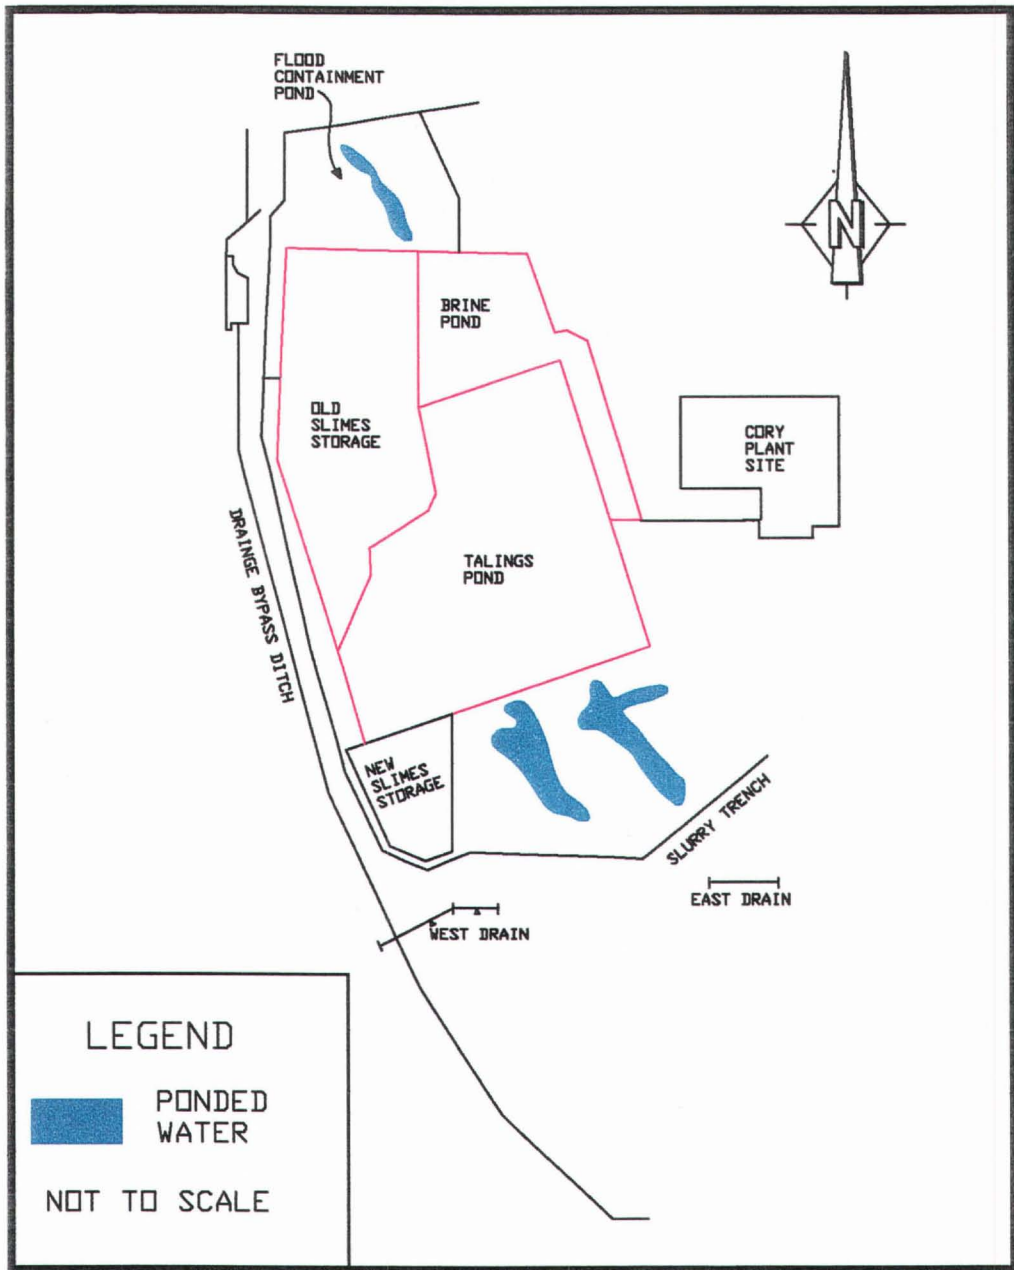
Plan view of PCS Cory Mine Showing the Location of the Tailings Facility, the Containment Structures and the Plant Site
